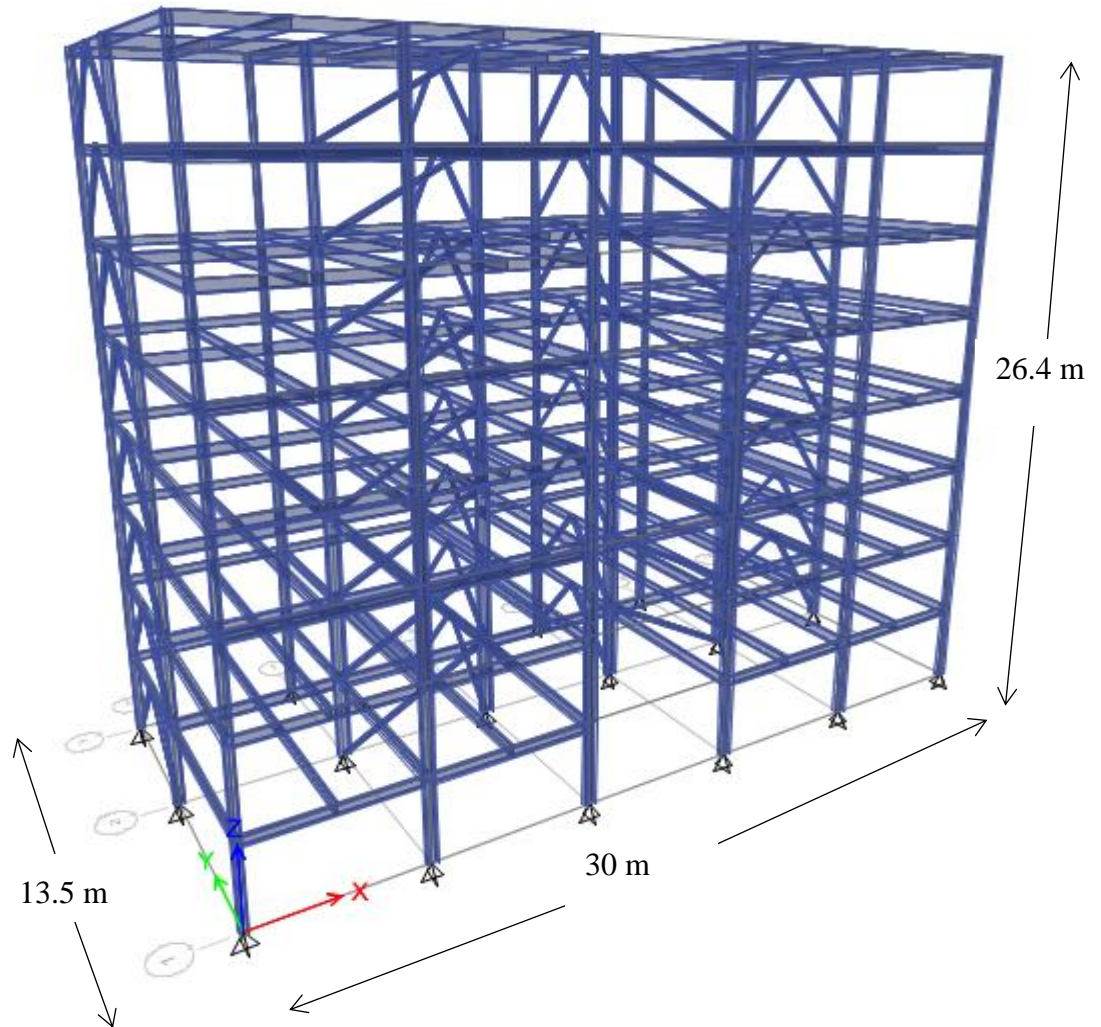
General 3-D view of the dormitory building (IR8F-I).
